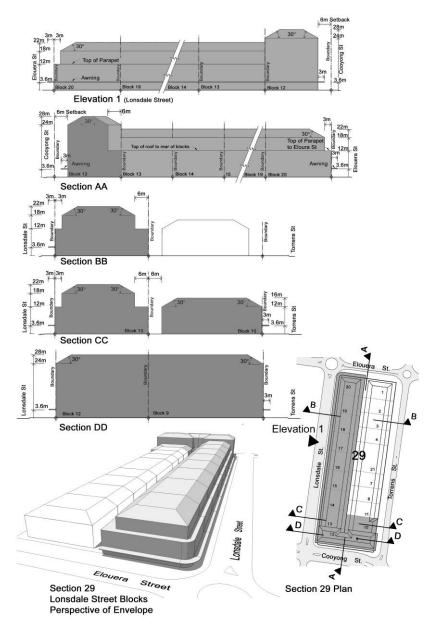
Building Envelope Diagram - Braddon section 29 blocks 9, 10, 12 - 20
